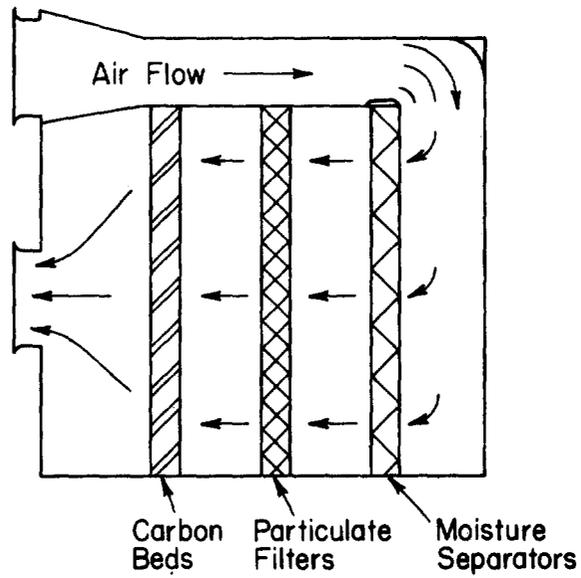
FILTER COMPARTMENT (ELEVATION CROSS SECTION)
